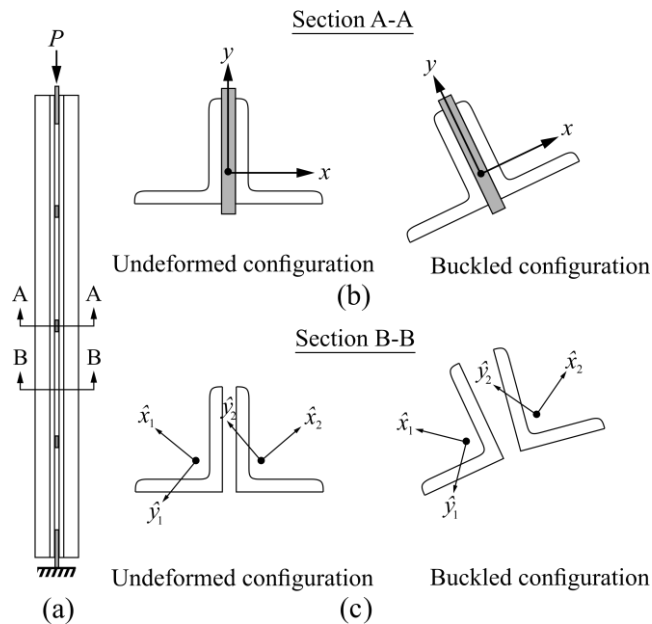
Back-to-back double angle assembly (a) Elevation view, (b) Cross-sectional view A-A at interconnector, (c) Cross-sectional view B-B away from interconnectors
